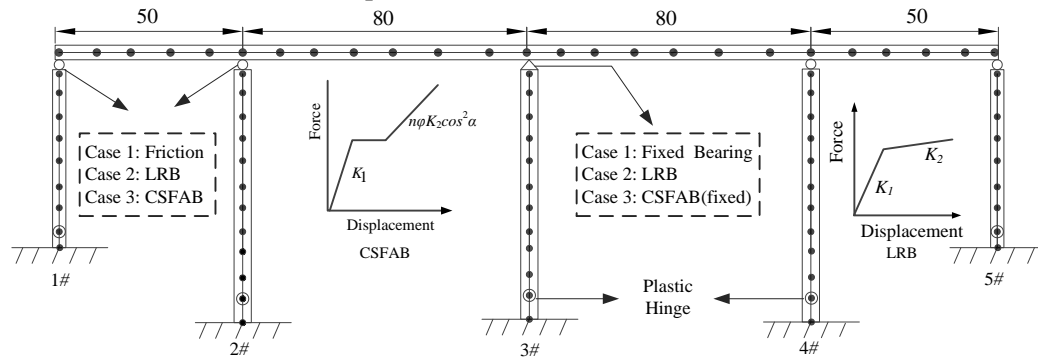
Schematic diagram of analytical model for bridge structure (unit: m)
